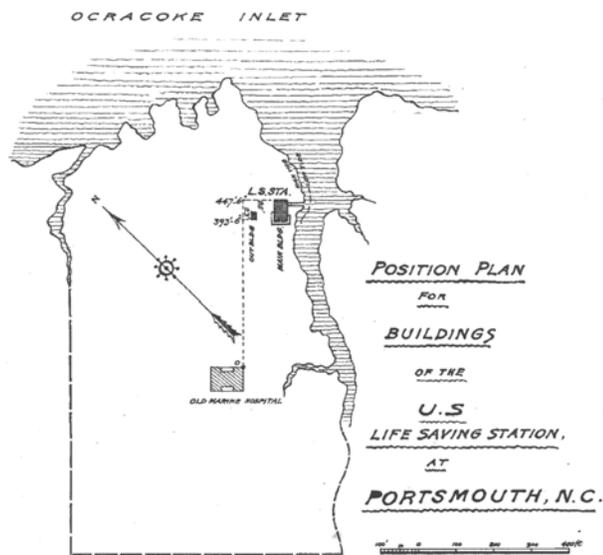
Plan for the first buildings of the Life-Saving Station, 1894.
